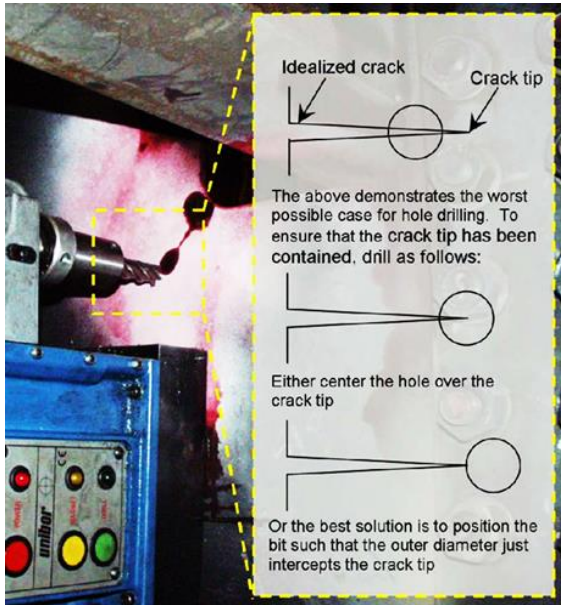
Correct placement of the drill bit and removal of the crack tip identified by red penetrant
